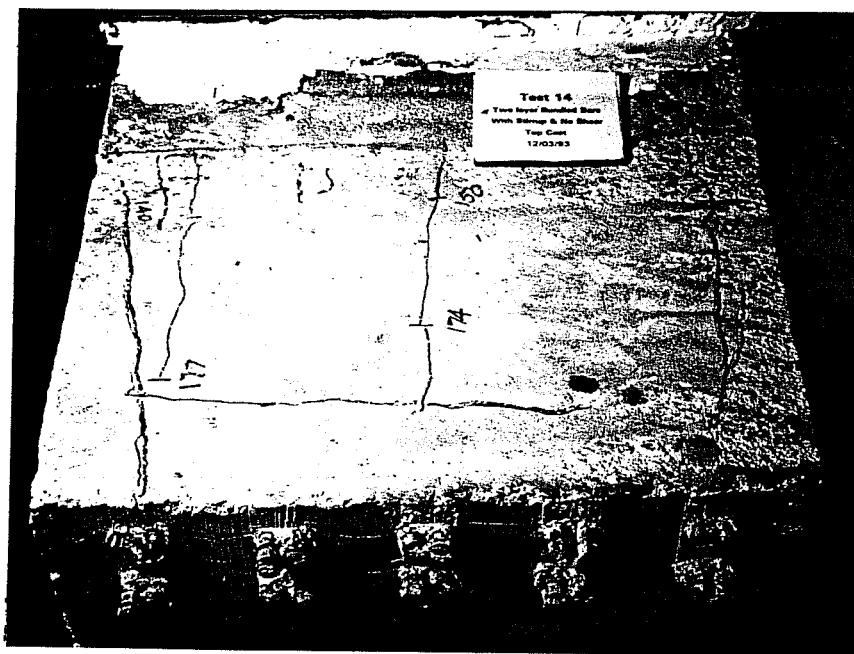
Failure mode for two layers of bundled bars with transverse reinforcement (Test 14 2-16-NS-T)
